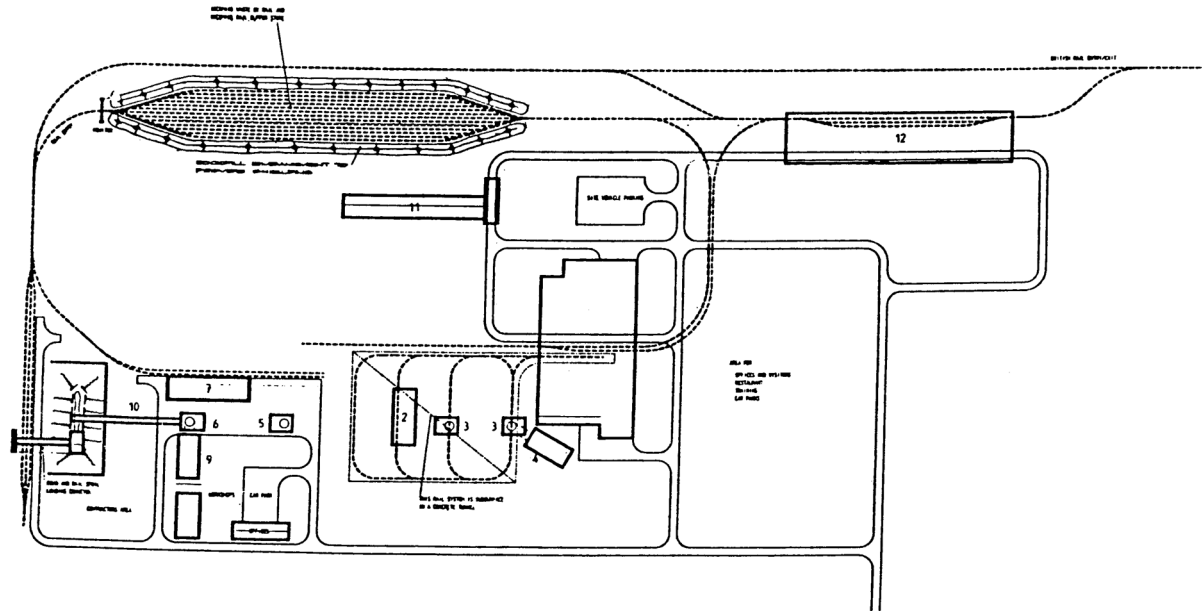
Proposed Layout of Surface Facilities for a Land Based Repository
